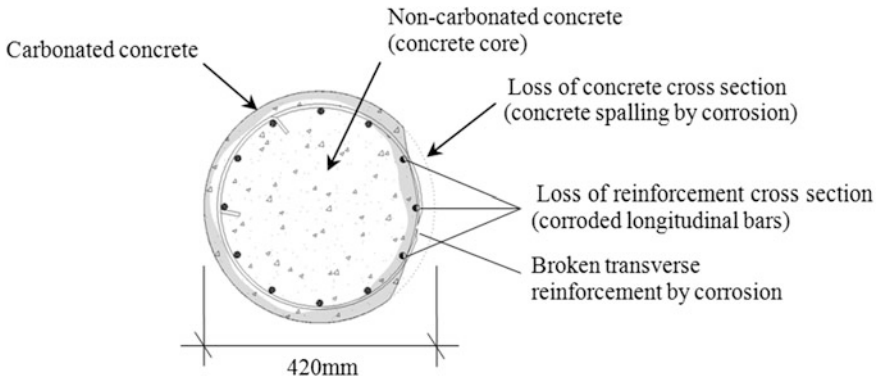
Damage due to corrosion of the rebars assumed for the studied RC column section: damage of the concrete part and steel reinforcement
